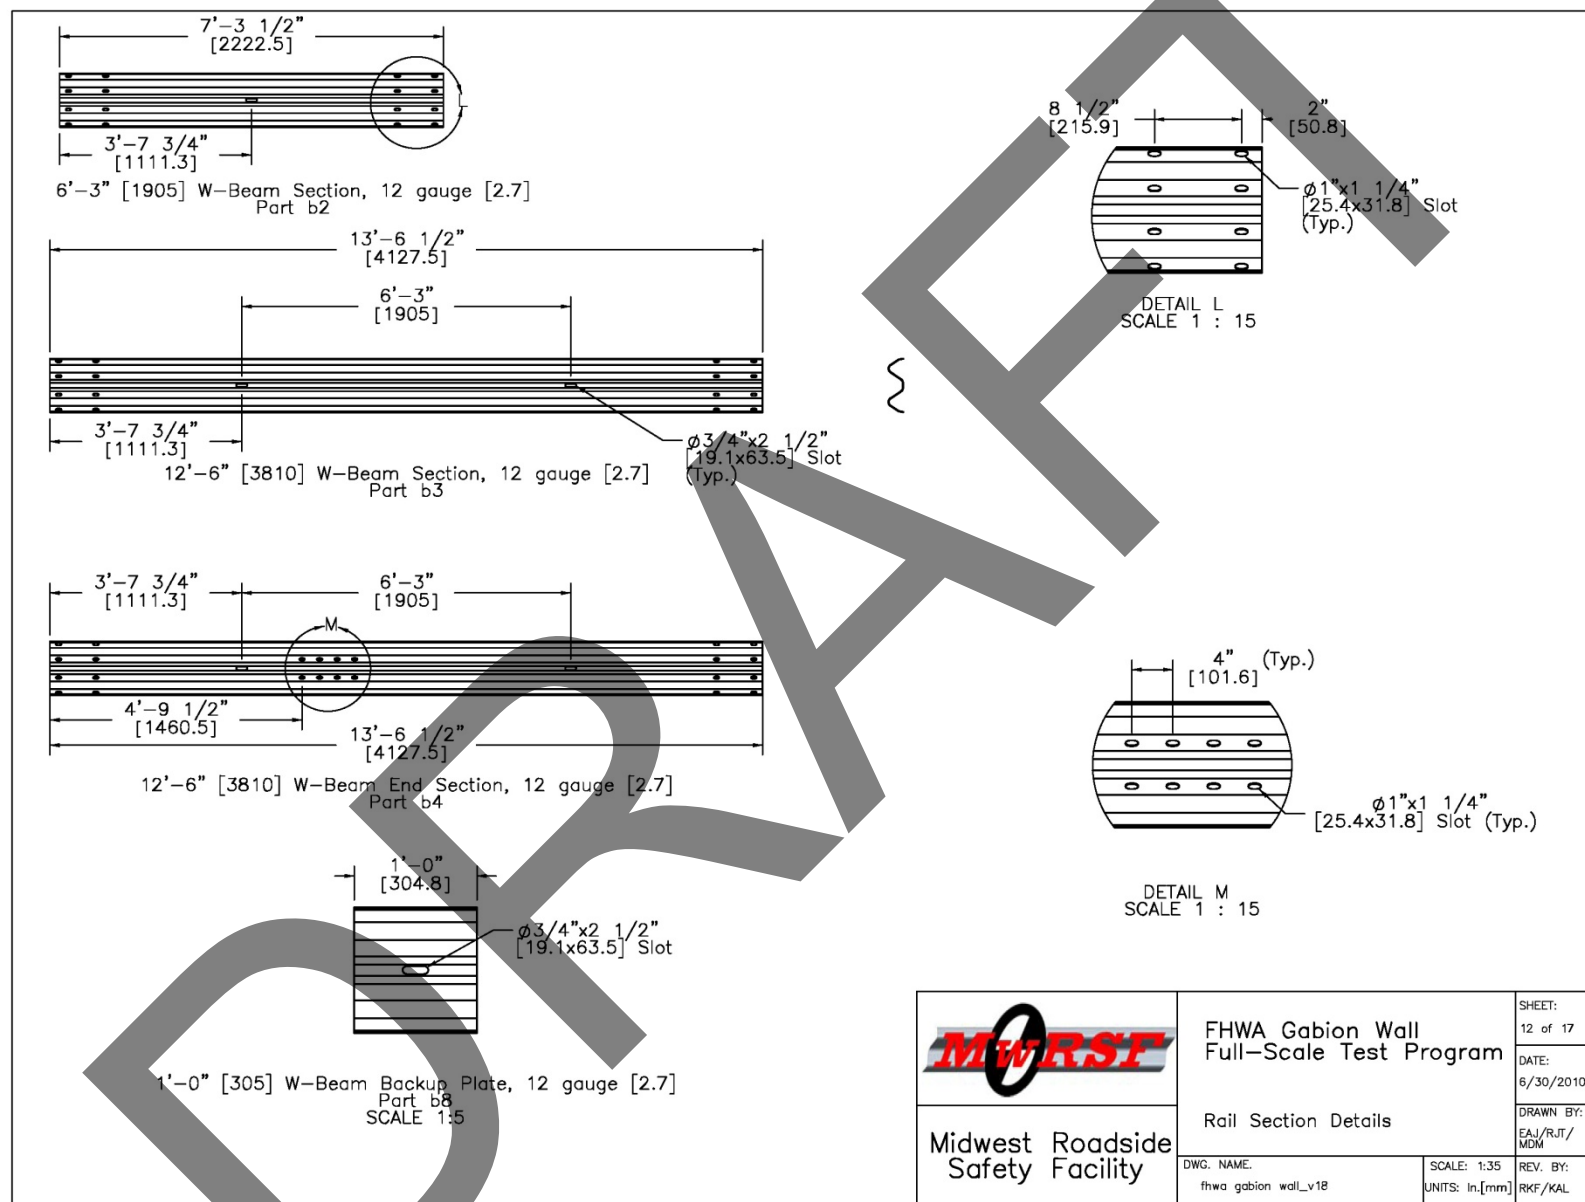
Schematic. Rail Section Details, Test Nos. MGSGW-1 and MGSGW-2.
